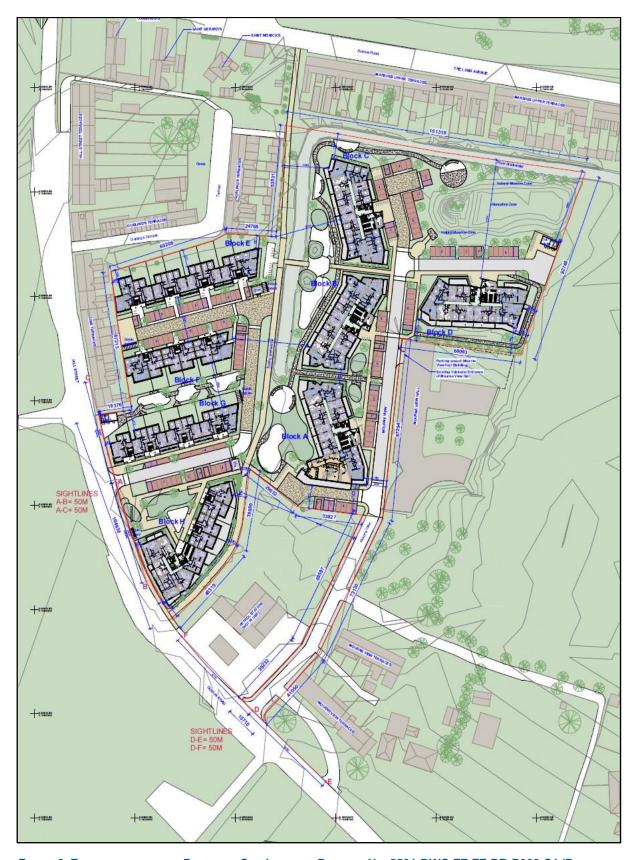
EXTRACTED FROM THE PROPOSED SITE LAYOUT – DRAWING No. 5501-DWC-ZZ-ZZ-DR-P003-S1 (DOUGLAS WALLACE ARCHITECTS, 2025)
